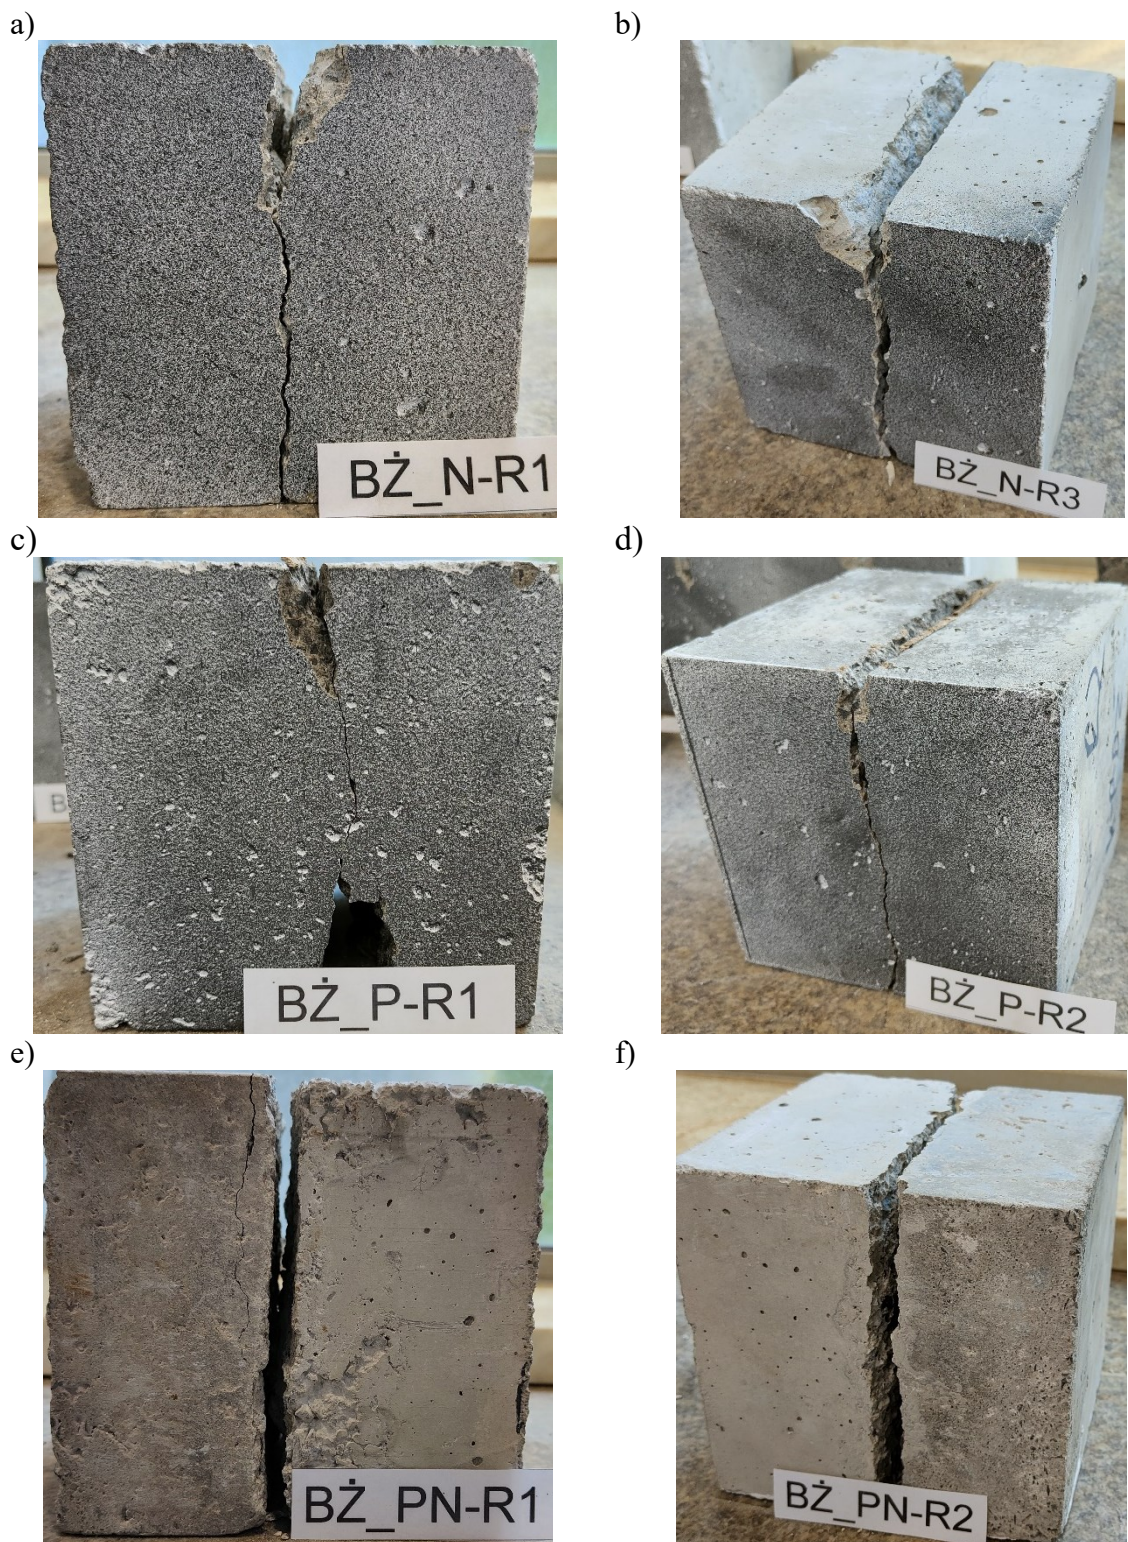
View of the specimen after the splitting test: a-b) Z-series topping concrete elements, c-d) Z-series precast concrete elements, e-f) Z-series composite of topping concrete and precast concrete as for the Z-series precast element
